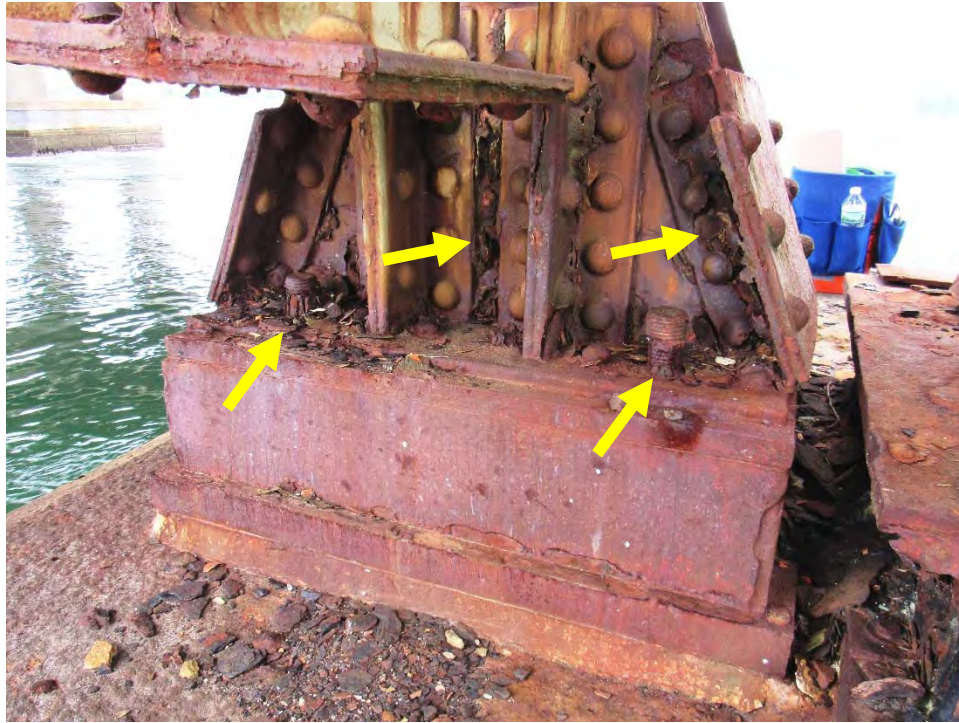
Pier 7 Fixed Bearing – Anchor Bolt and Stiffener Deterioration
